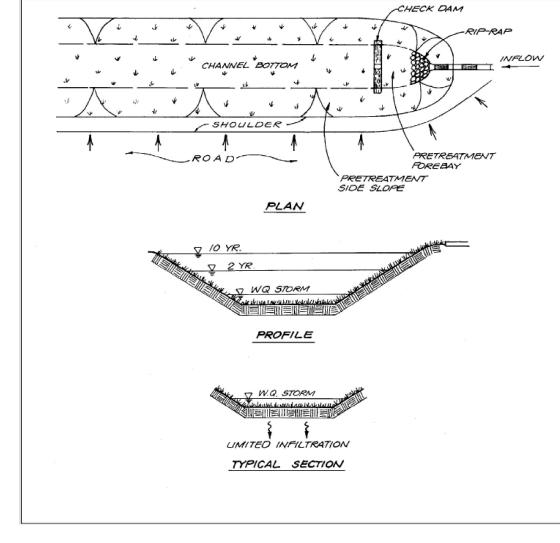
Grass Channel – Typical Plan, Profile and Section
